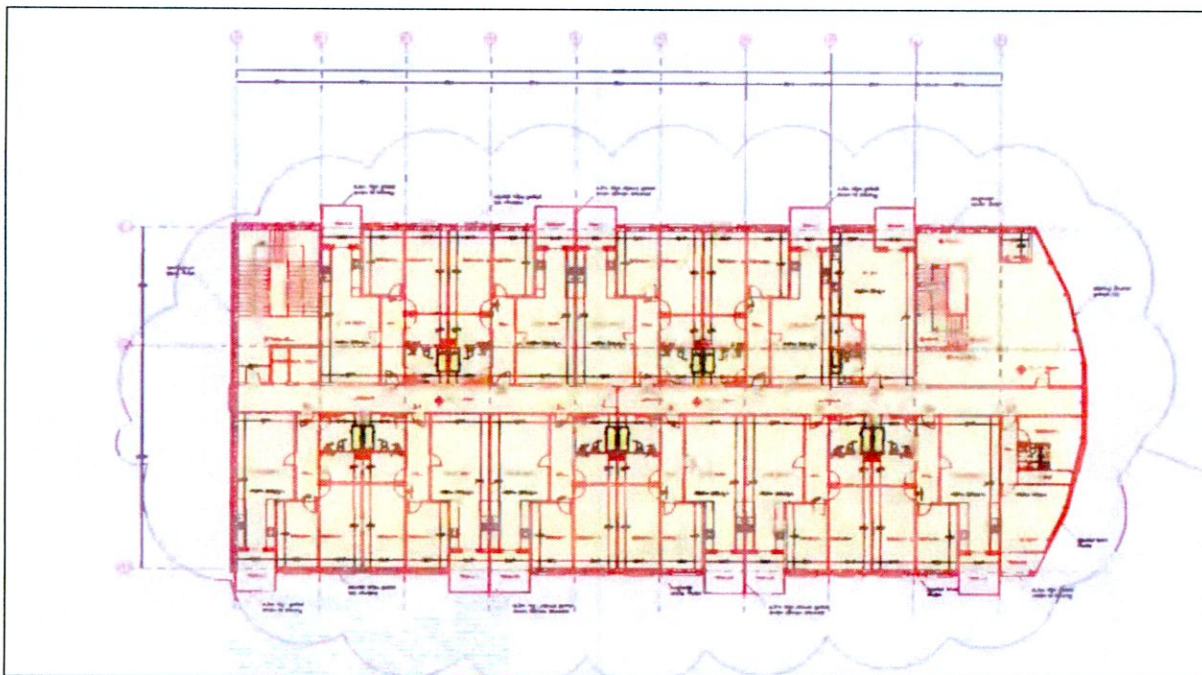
Second floor plan proposed under Reg. Ref. SD16A/0249 to amend floor layout incorporating an additional 3 no. apartments.
